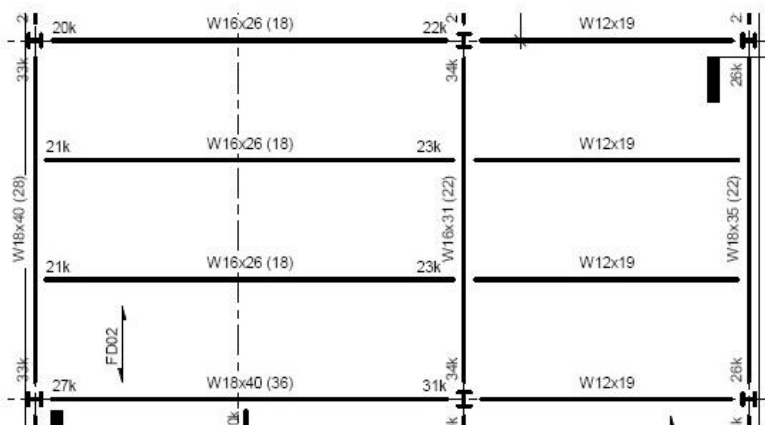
Typical bay layout for building wing. Detail courtesy of Cannon Design.
